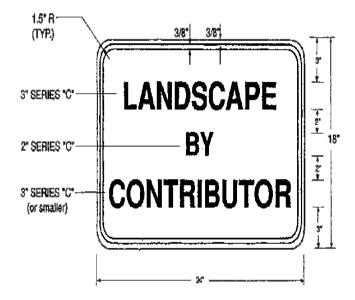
Arterial and Limited Access Landscape Roadway Sign
